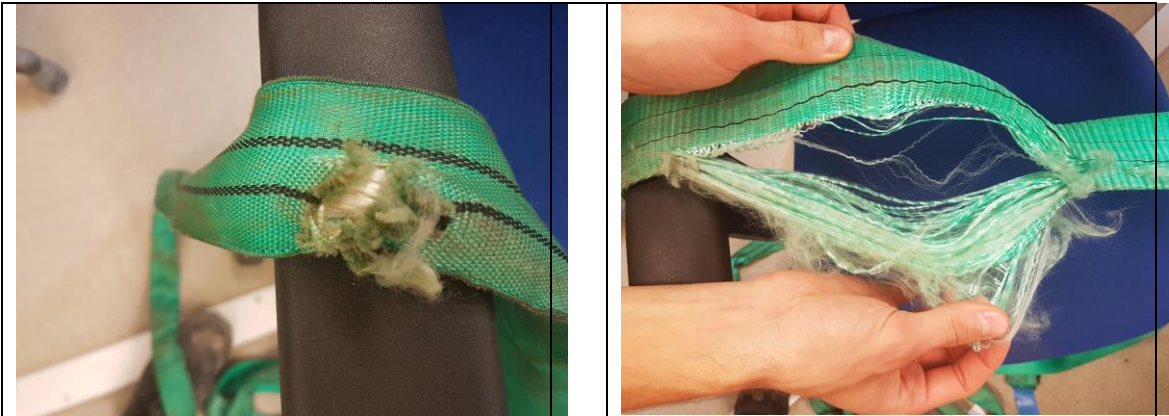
Examples of loads arriving on site with damaged lifting slings
